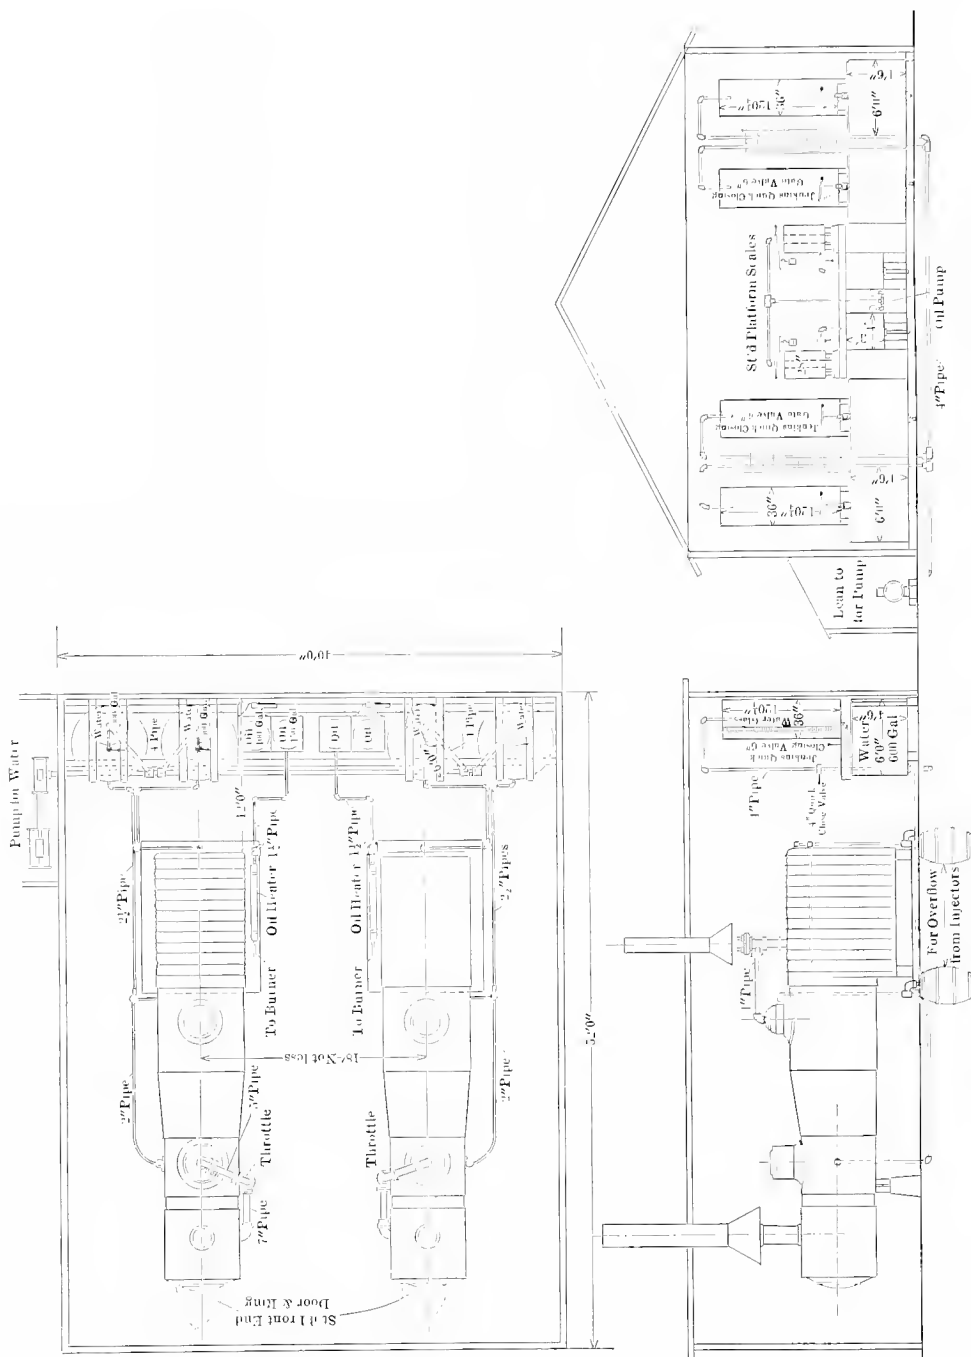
Plan, elevations and section of Testing Laboratory, showing boilers as arranged for the oil-fired tests. (Series A.)
